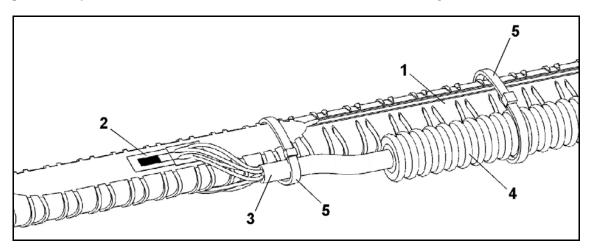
The measurement area of the strain sensor before application of protection coatings: 1 - reinforcement bar; 2 - strain gage with solder points; 3 - connection cable; 4 - PE tube for cable protection; 5 - PE binding element used to fix the cable to the reinforcement bar
